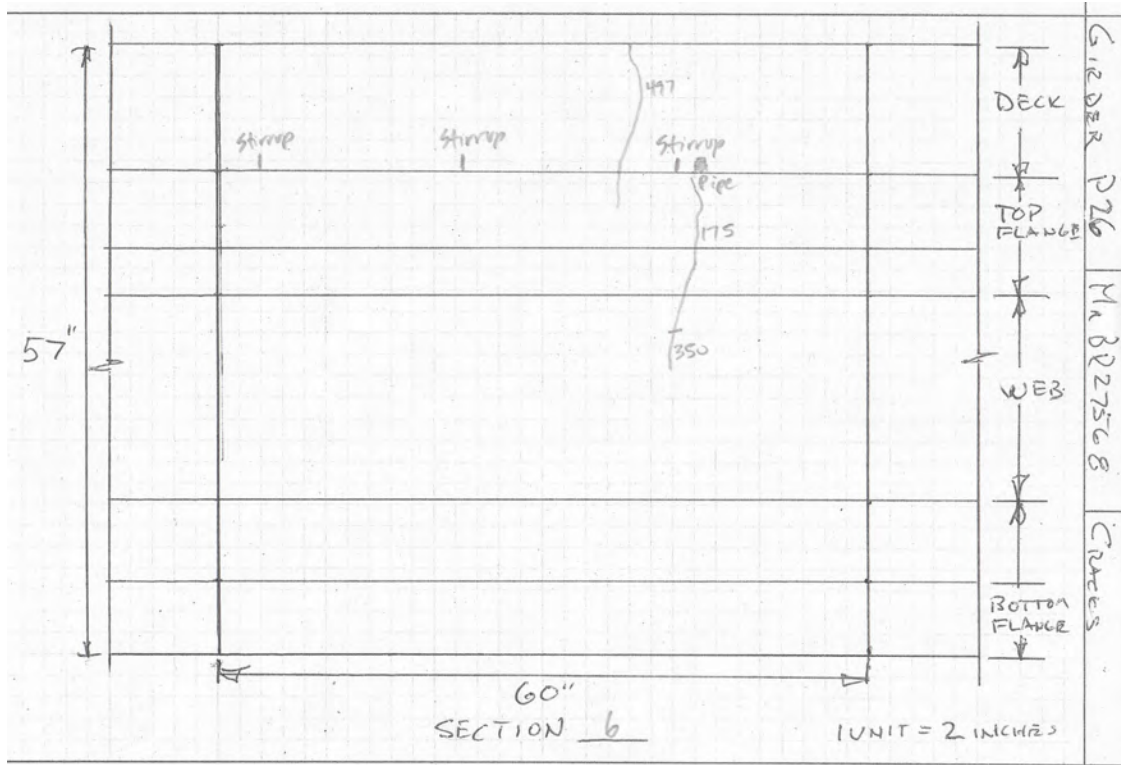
Girder P26 crack pattern – Section 6
